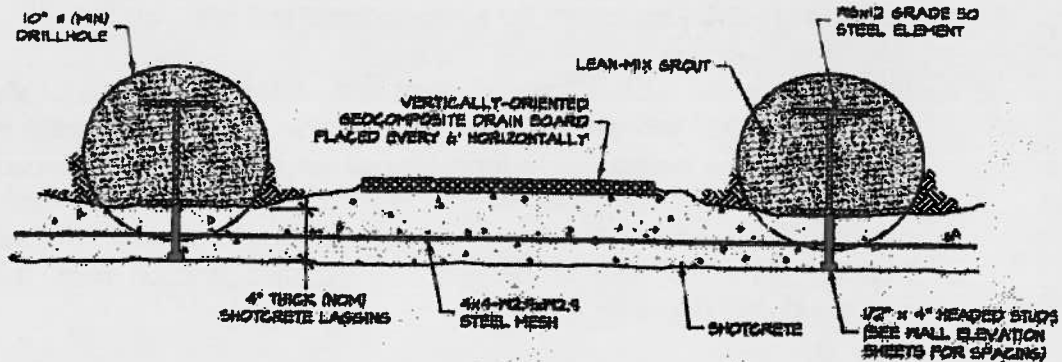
Horizontal Section Depicting Vertical Elements Without Soil Nails
